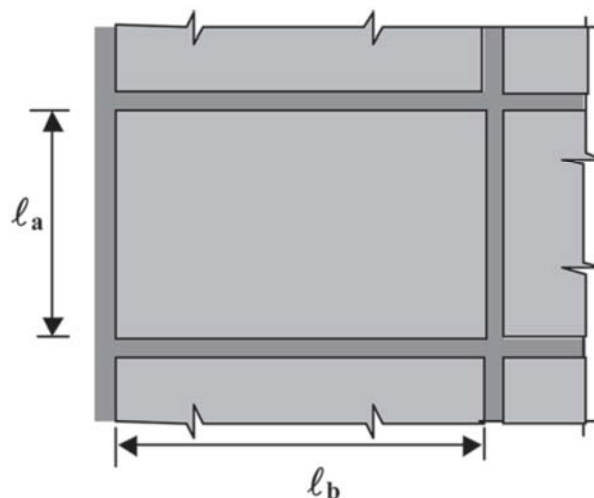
Edge panel with ℓ_a parallel to edge of two-way slabs supported on girders, beams, or walls.
